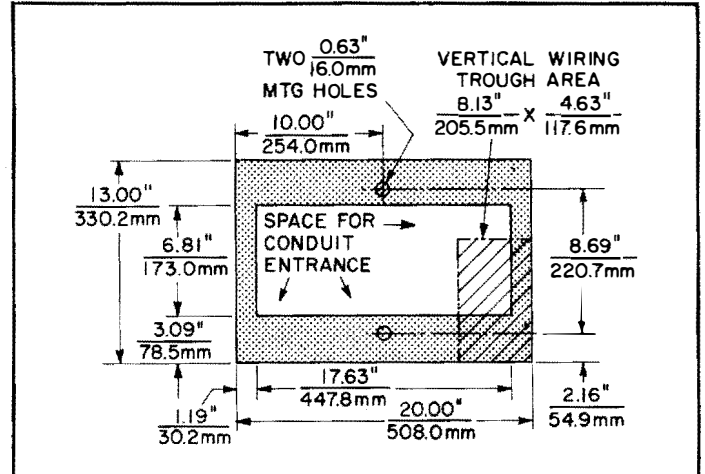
Bottom conduit entrance space 13-inch (330.2 mm) deep section.
